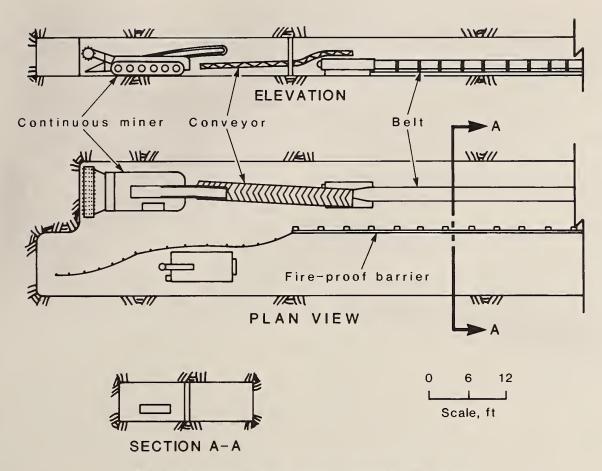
Elevation and plan view of Sunnyside split single entry.
